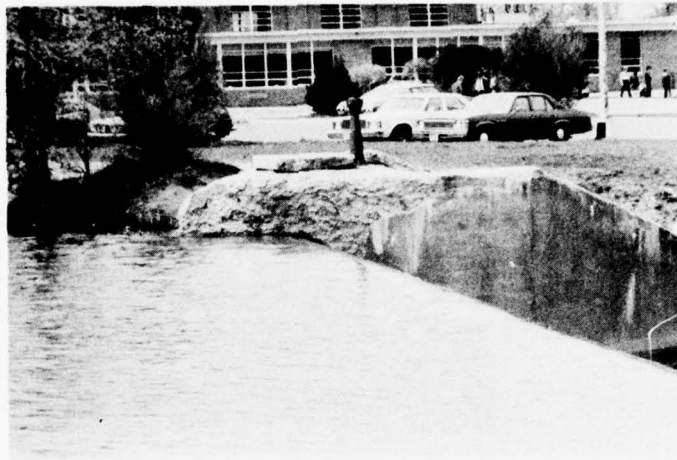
Close-up of the left abutment spillway wingwall showing deteriorated concrete
